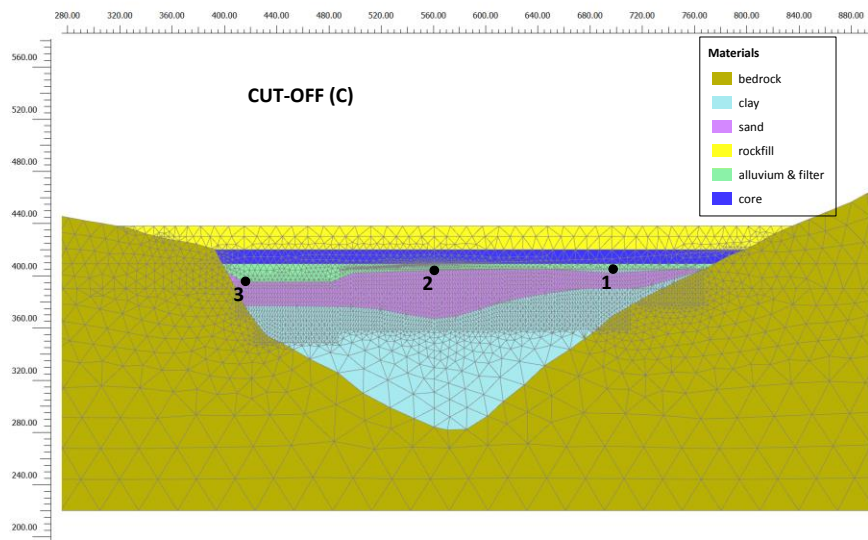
Geometry of longitudinal section C (cut-off wall)
